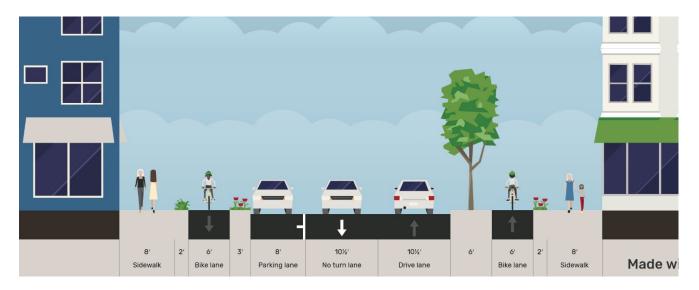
Silver Spring Avenue Between Georgia Avenue and Fenton Street
